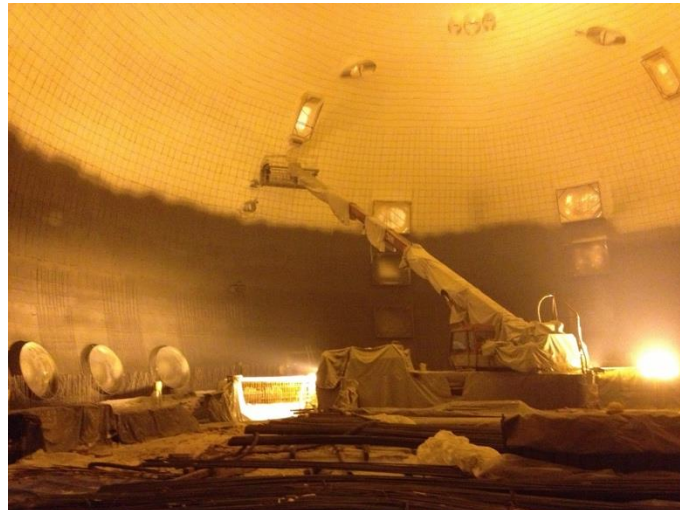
Construction site photograph. from inside a pneumatic mold. Concrete shell formation using spray technique. (Uygur Architecture Archive)
